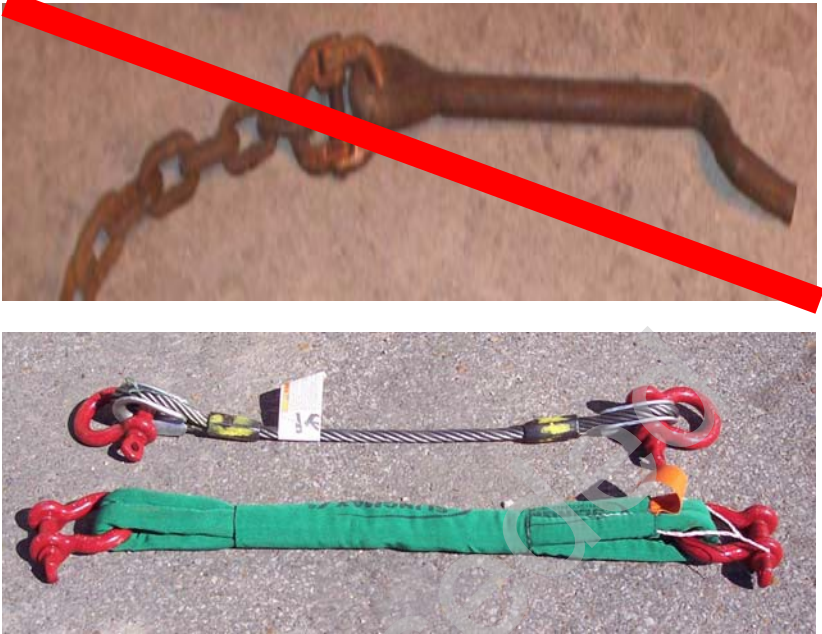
DO NOT USE CHAINS OR PIGTAILS for rail unloading; use nylon slings or steel cables.
